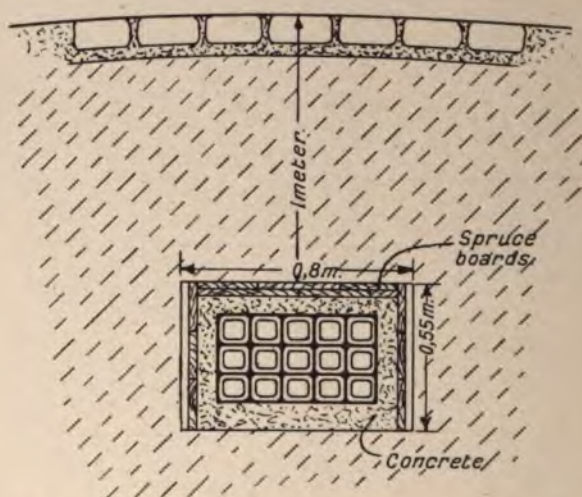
SECTION THROUGH UNDERGROUND CONDUIT.
